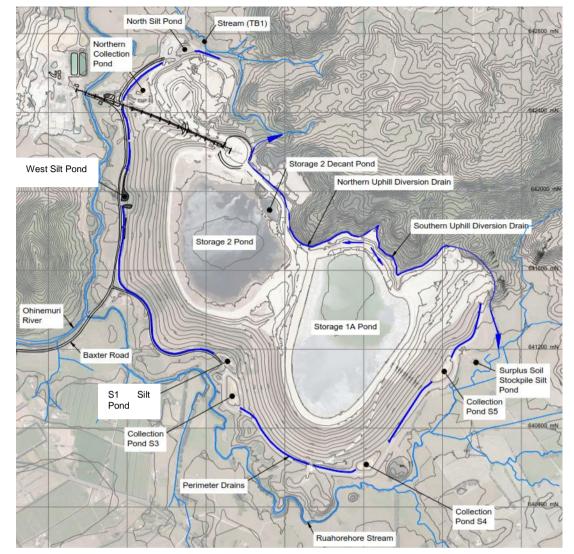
SURFACE WATER DRAINS, COLLECTION PONDS AND SILT PONDS
